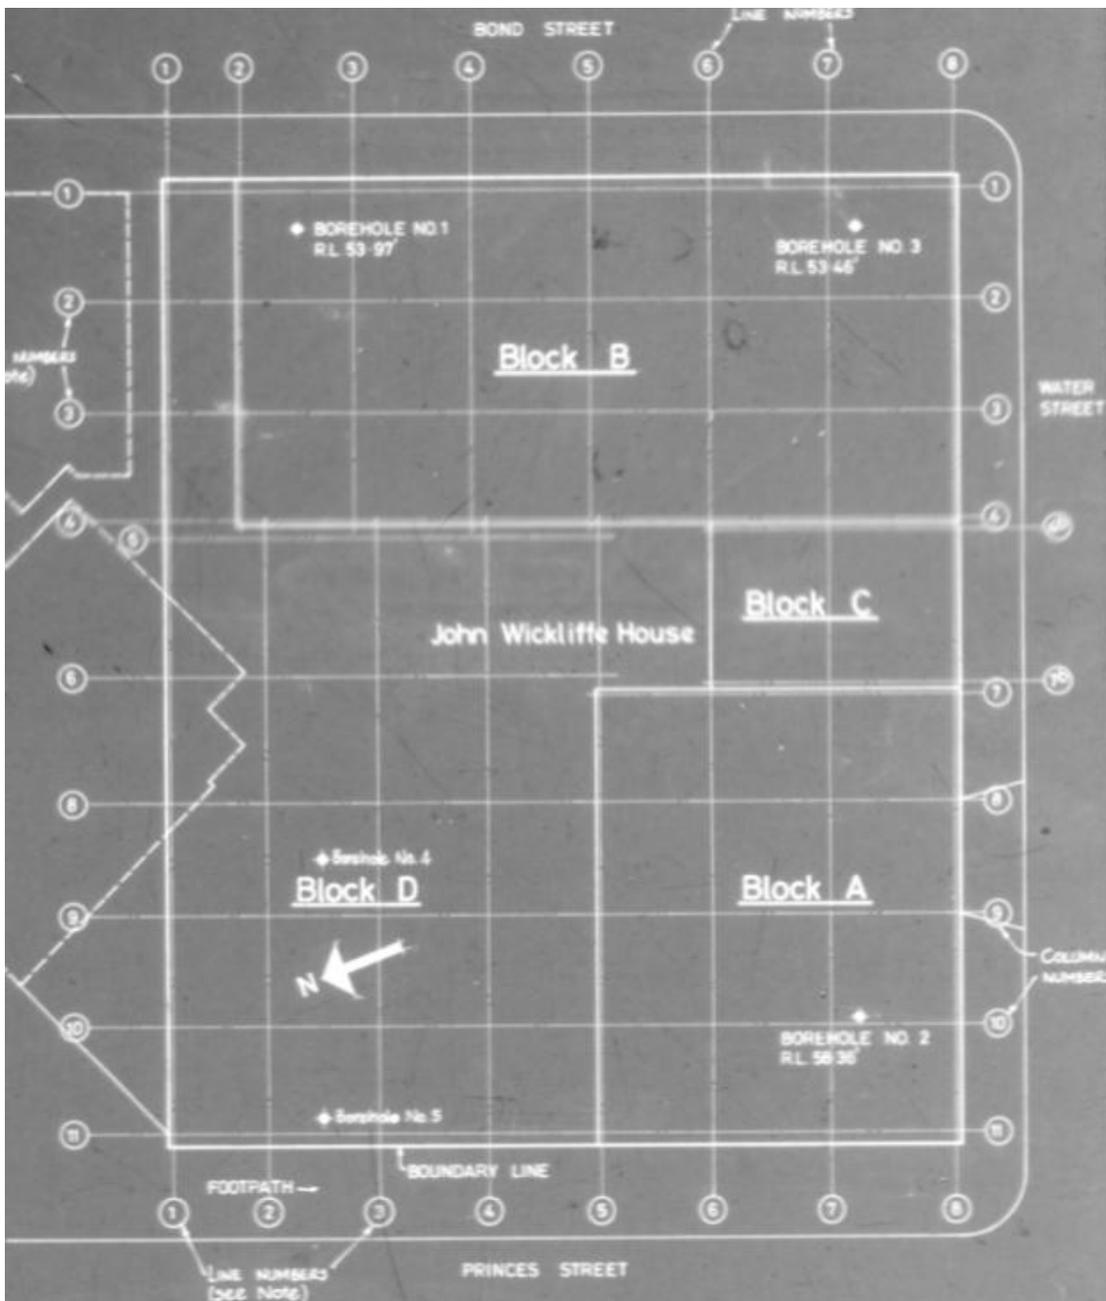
Excerpt from the original construction drawings showing the layout of the separate blocks. The blocks are referenced thus in the following text.
